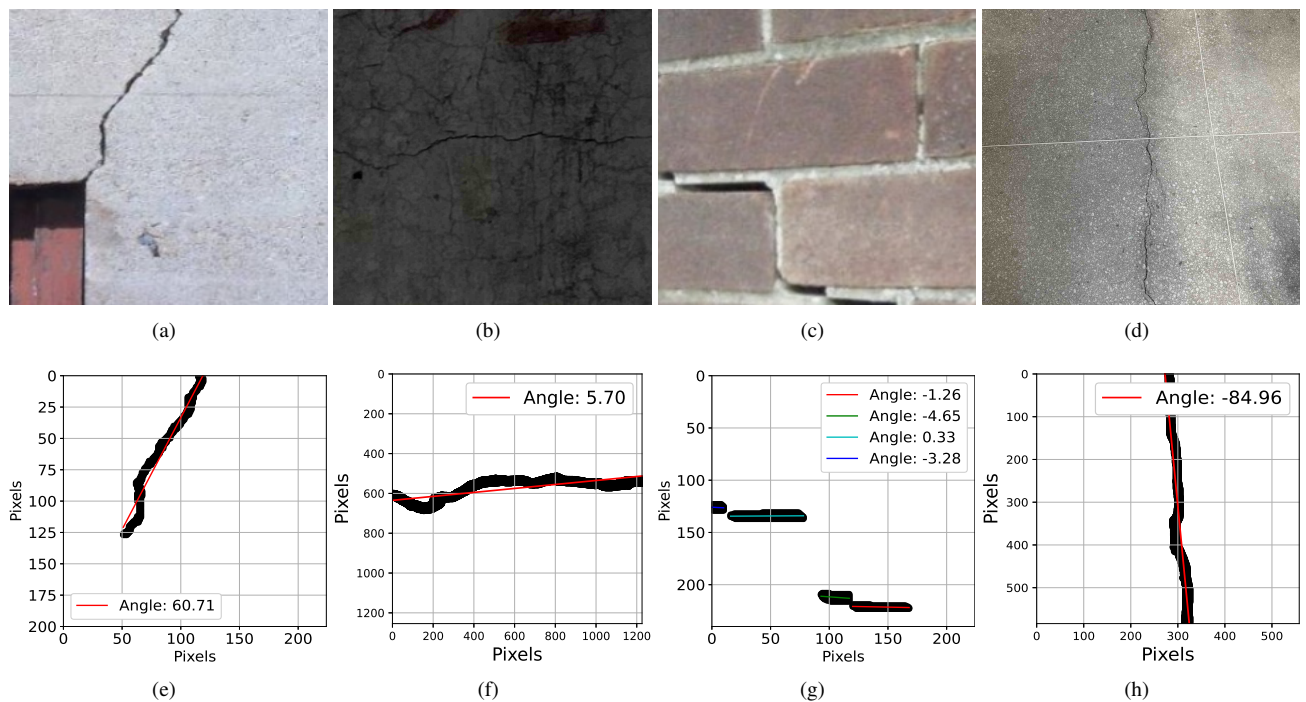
Example of isolated cracks: (a) crack in the corner of the door, (b) street light pole crack, (c) crack in the brick, (d) floor crack, (e) crack in the corner of the door from (a), (f) street light pole crack from (b), (g) crack in the brick wall of a house from (c), and (h) floor crack from Figure (d) .
